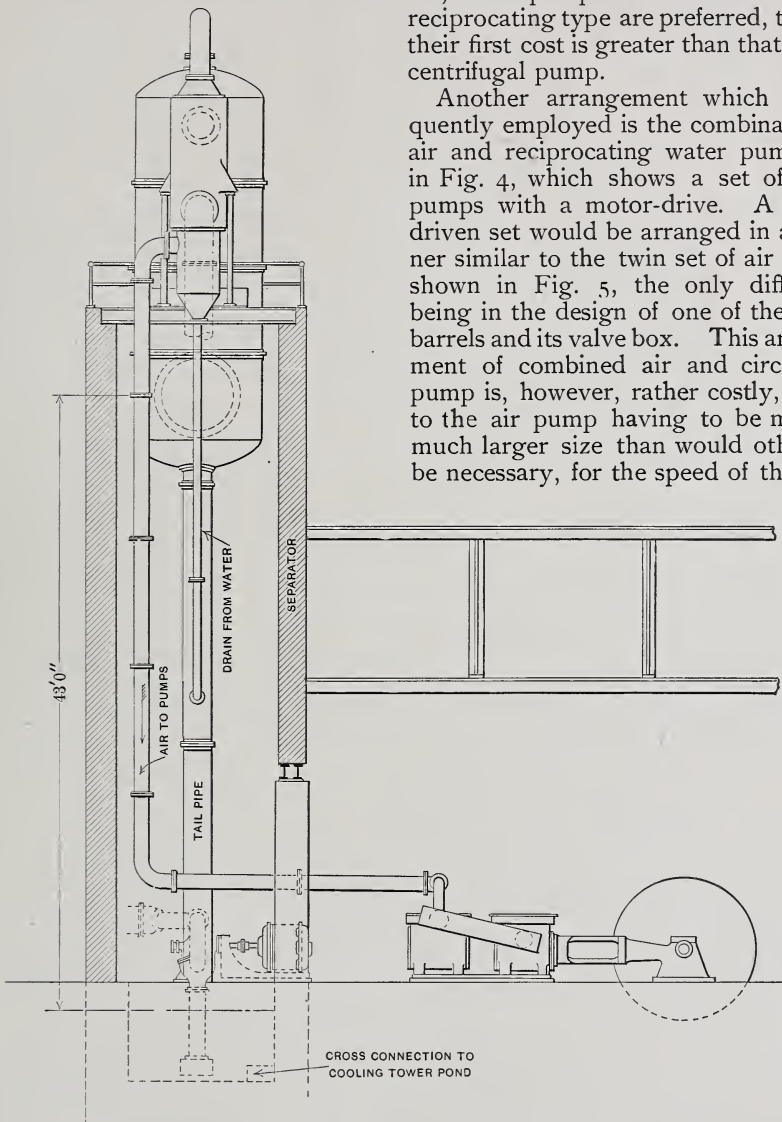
A SIDE ELEVATION OF FIG. 6
